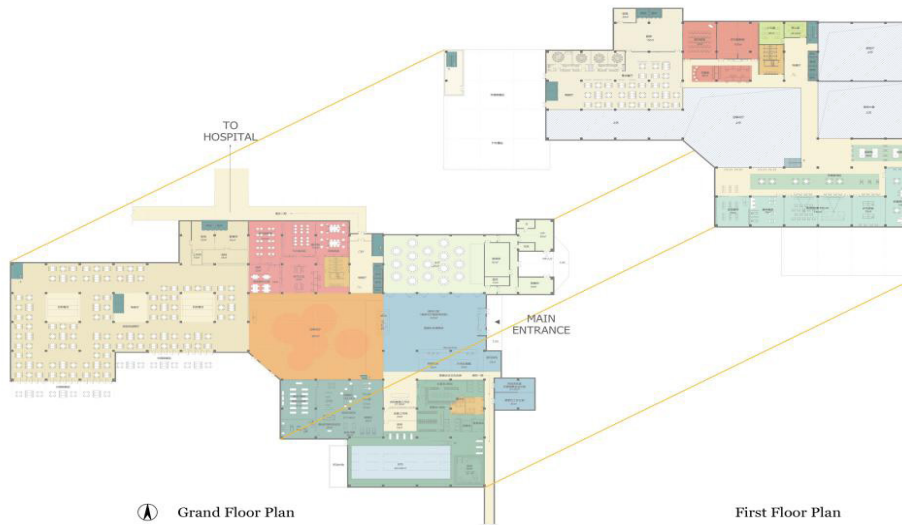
Design drawings of Ru Garden: Grand floor and first floor plans of the leisure centre (Source: drawn by authors).
